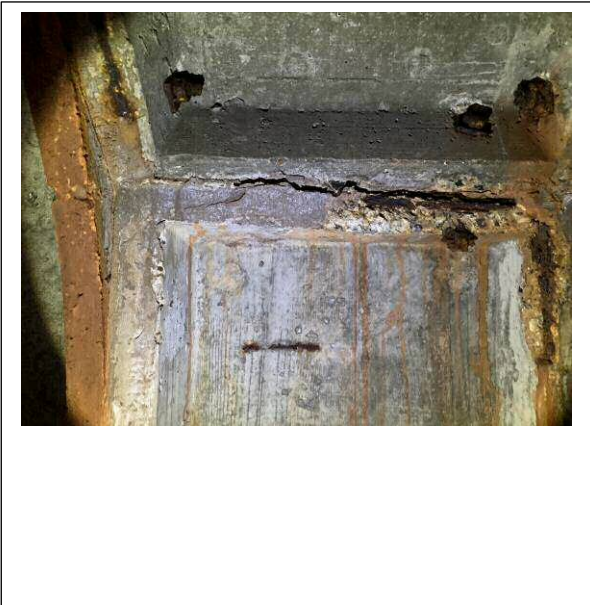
Primary roof reinforcement exposure and corrosion.
